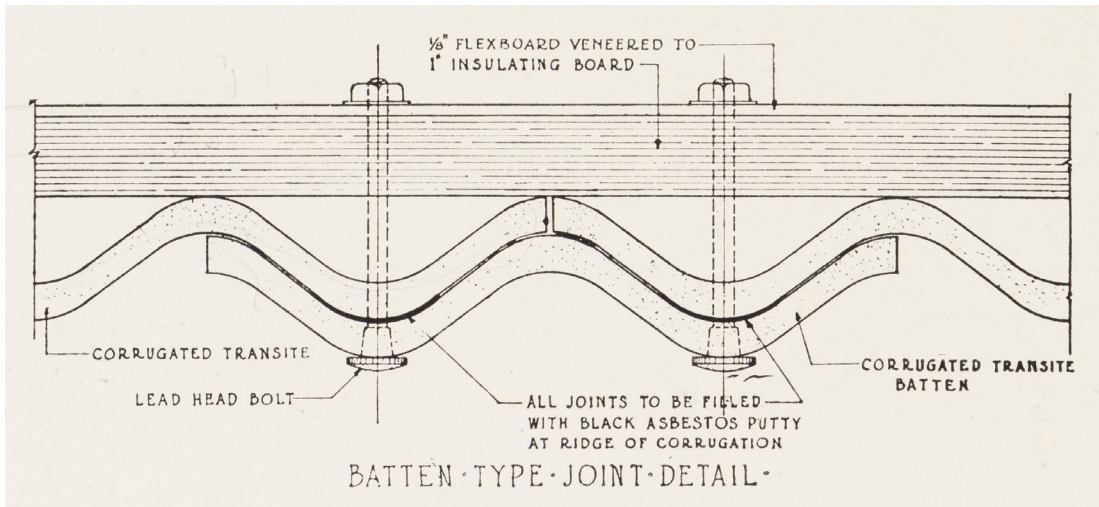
Joint detail for Johns-Manville's J-M Curtain Wall showing Corrugated Transite applied on-site to Encased Insulating Board (Johns-Manville 1944, 35). Courtesy of Canadian Centre for Architecture.
